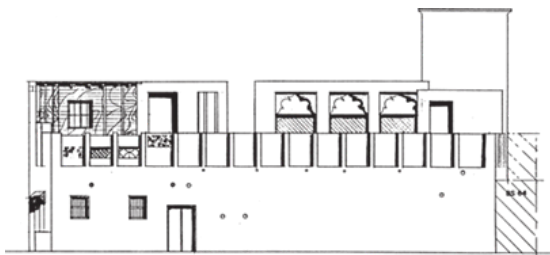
, floor plans barajeel house (Damluji, 2006, p.186), own analysis.
